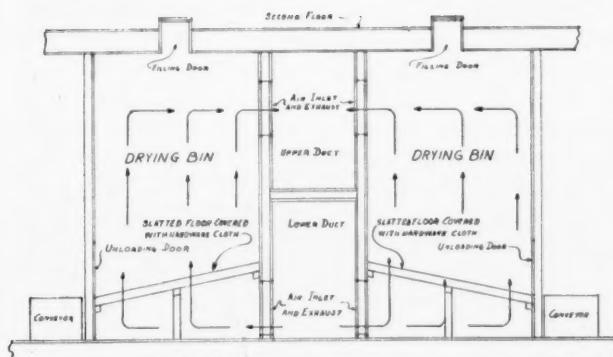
Cross-section of drying bins showing slatted floor, upper and lower air ducts, loading door and air openings.
